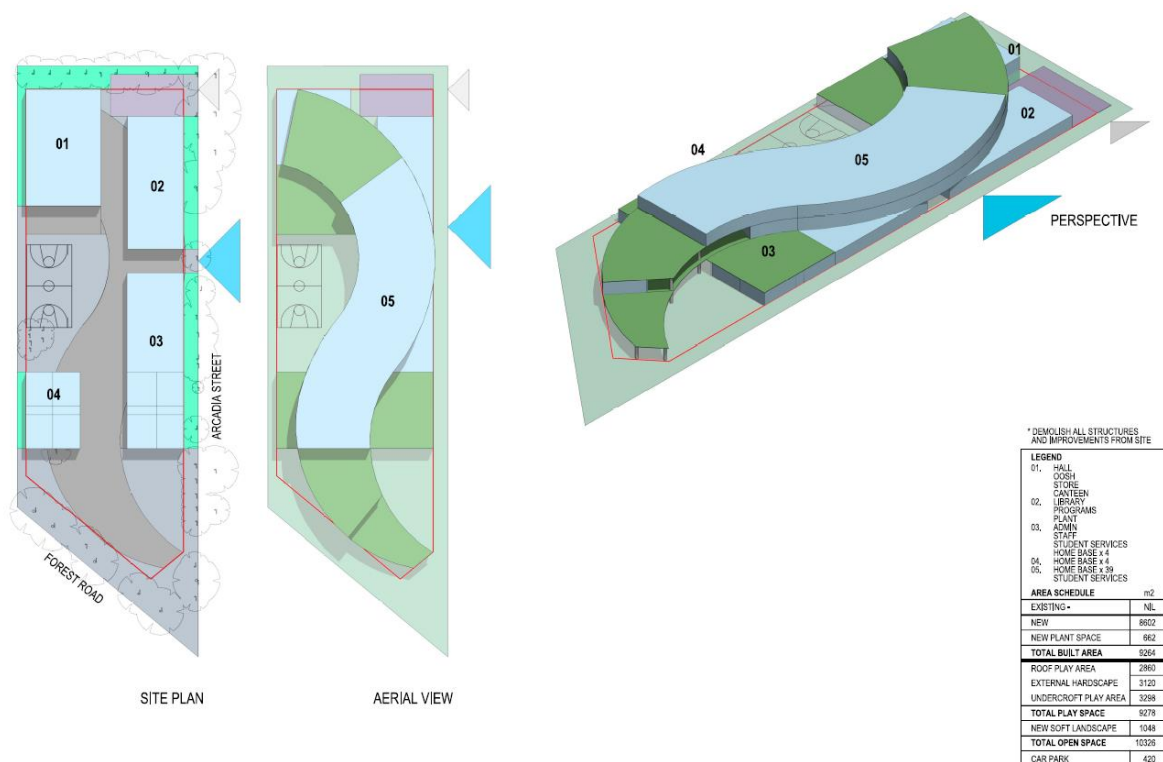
Extract of Concept Plan (Perumal Pedavoli Architects)
